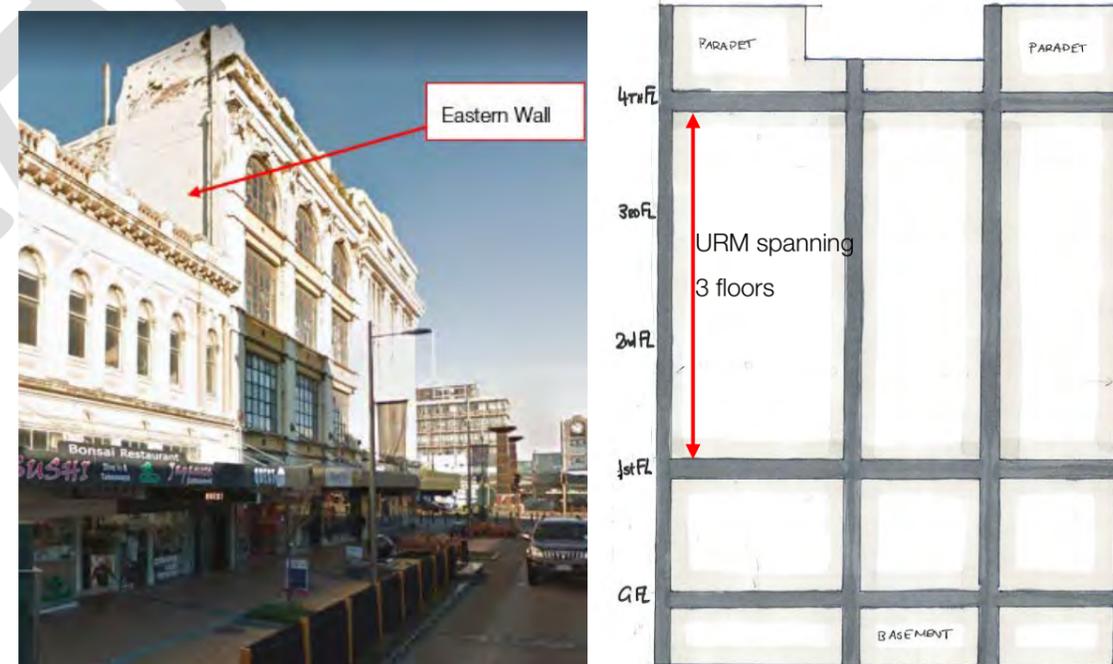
Location of eastern URM wall (left), sketch of approximate configuration of eastern URM wall (right)
